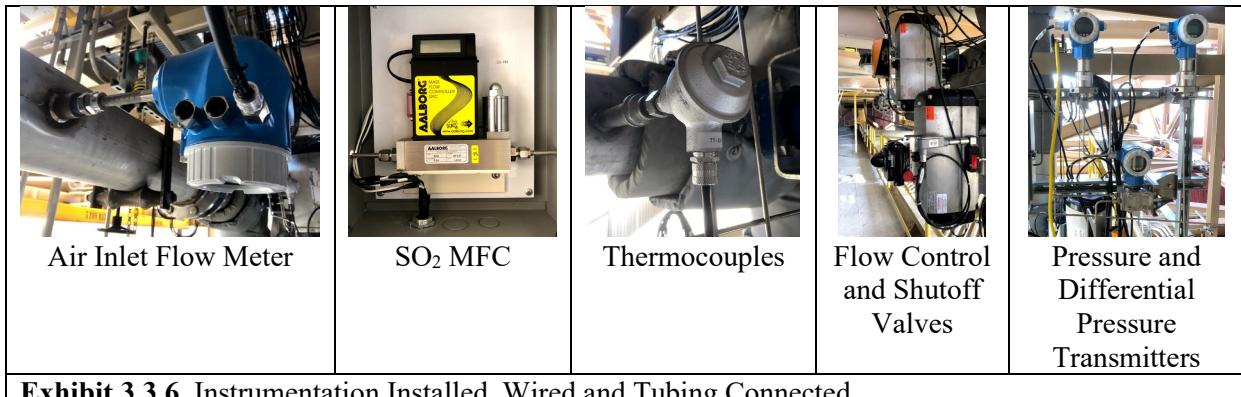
Instrumentation Installed, Wired and Tubing Connected.
